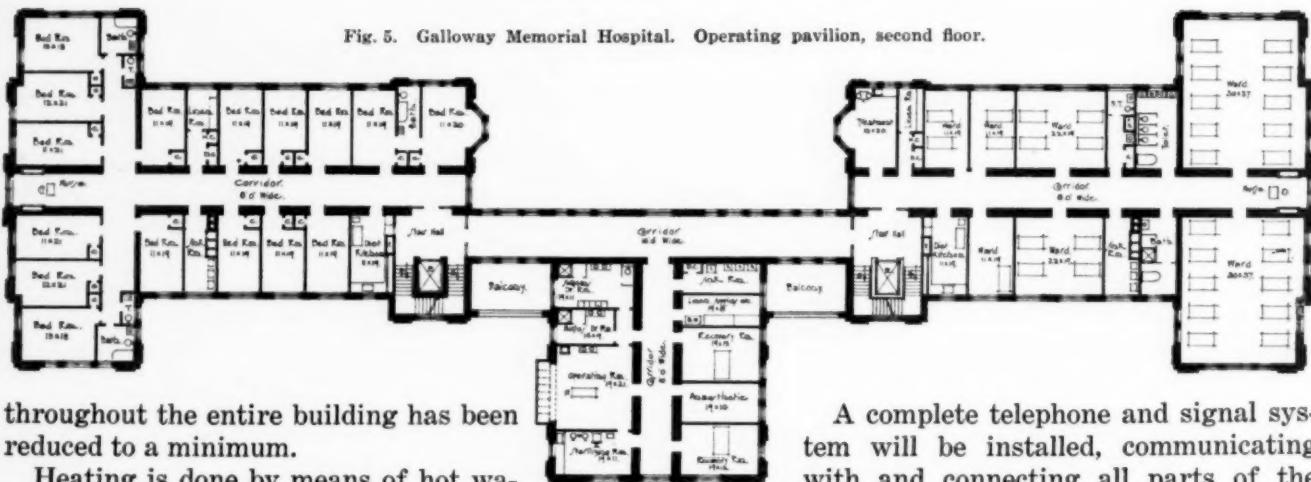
Galloway Memorial Hospital. Operating pavilion, second floor.
